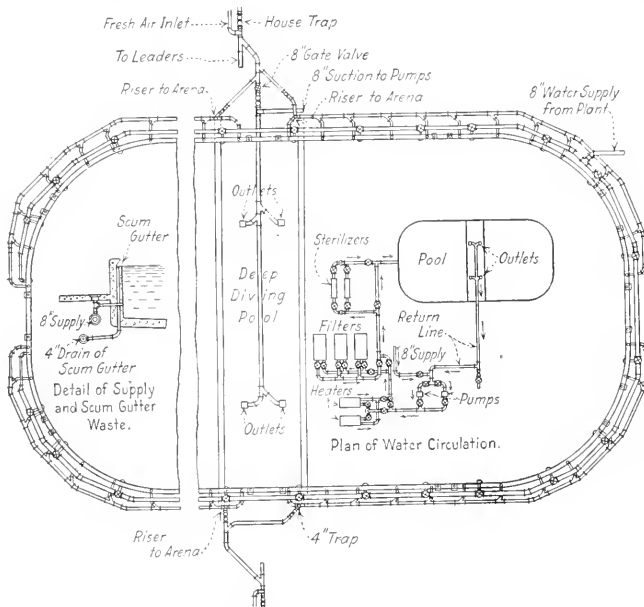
PLAN OF THE MADISON SQUARE GARDEN SWIMMING POOL, SHOWING THE LAYOUT OF THE SUPPLY AND DRAINAGE PIPING AND INDICATING THE RELATIVE POSITION OF PUMPS, HEATERS, FILTERS AND STERILIZERS
